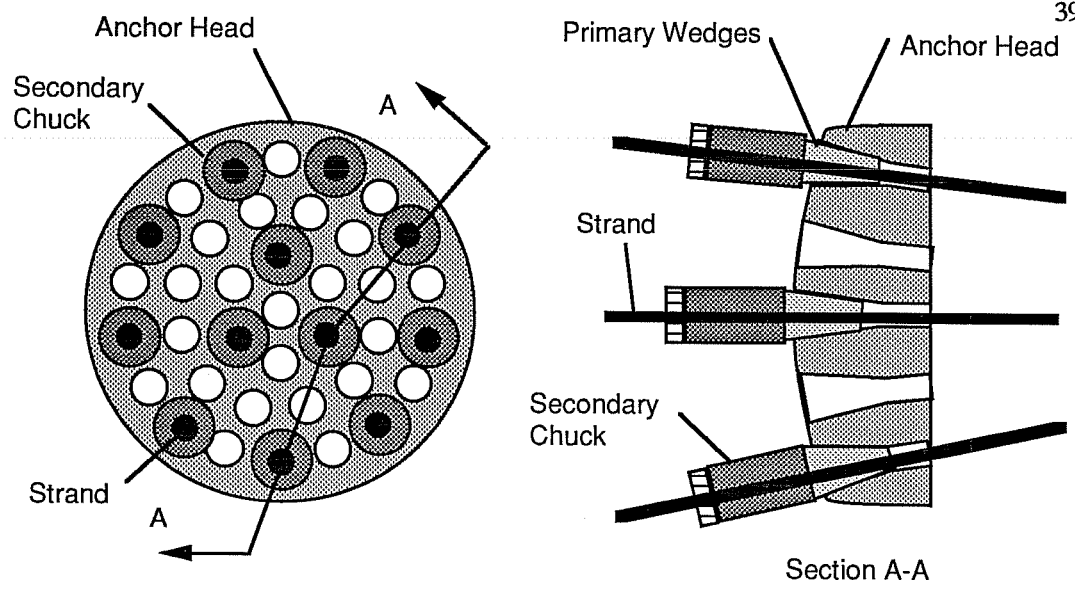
Double-Chuck Grip System for Multi-Strand Anchor Head.
